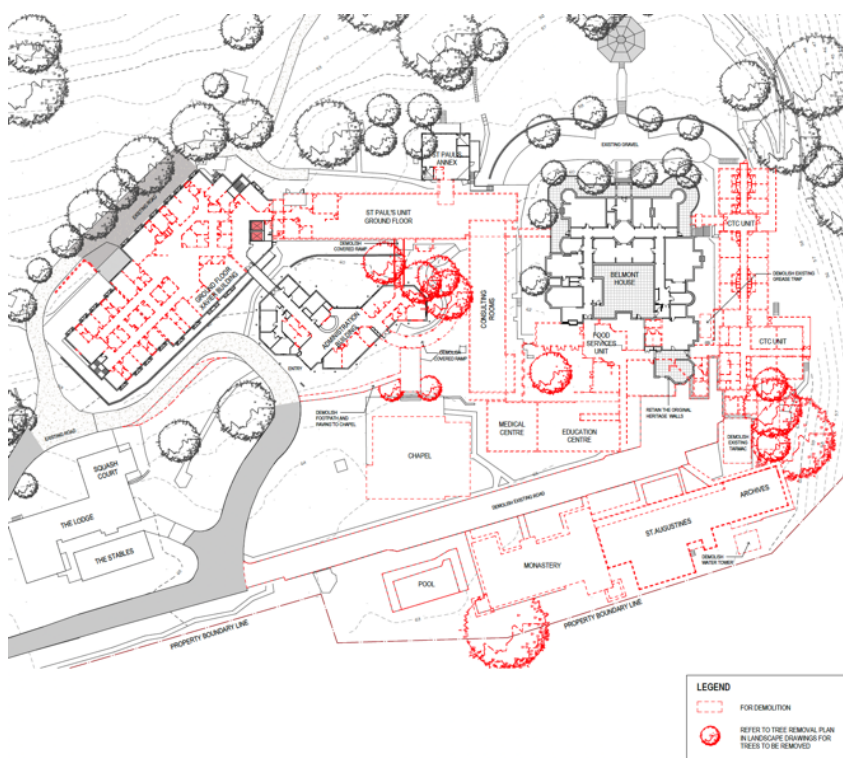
DEMOLITION PLAN. St John of God Richmond Hospital.
